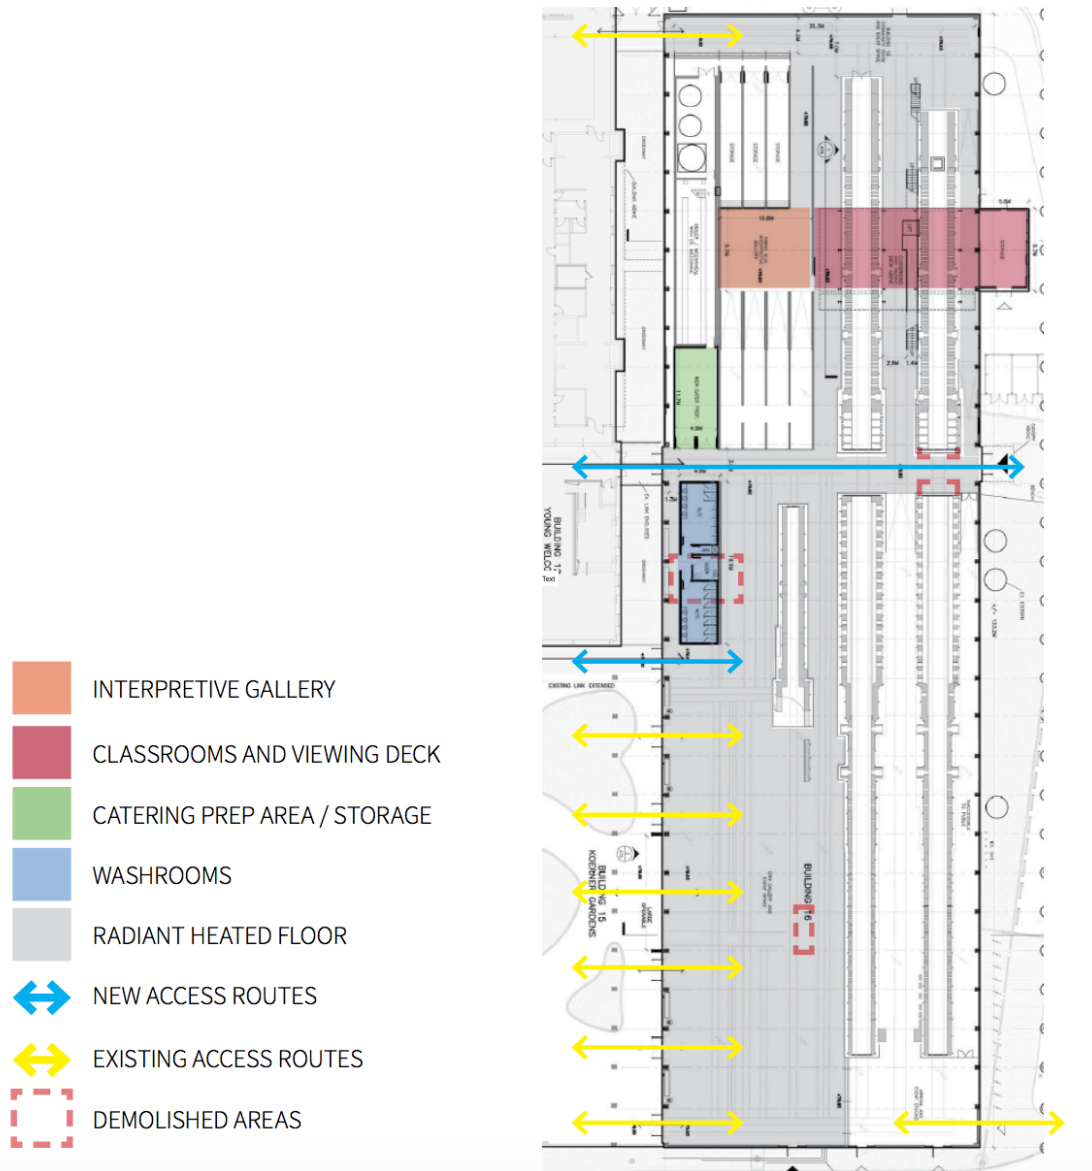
Building 16 Retrofit Overview (ERA Architects Inc., 2016)
